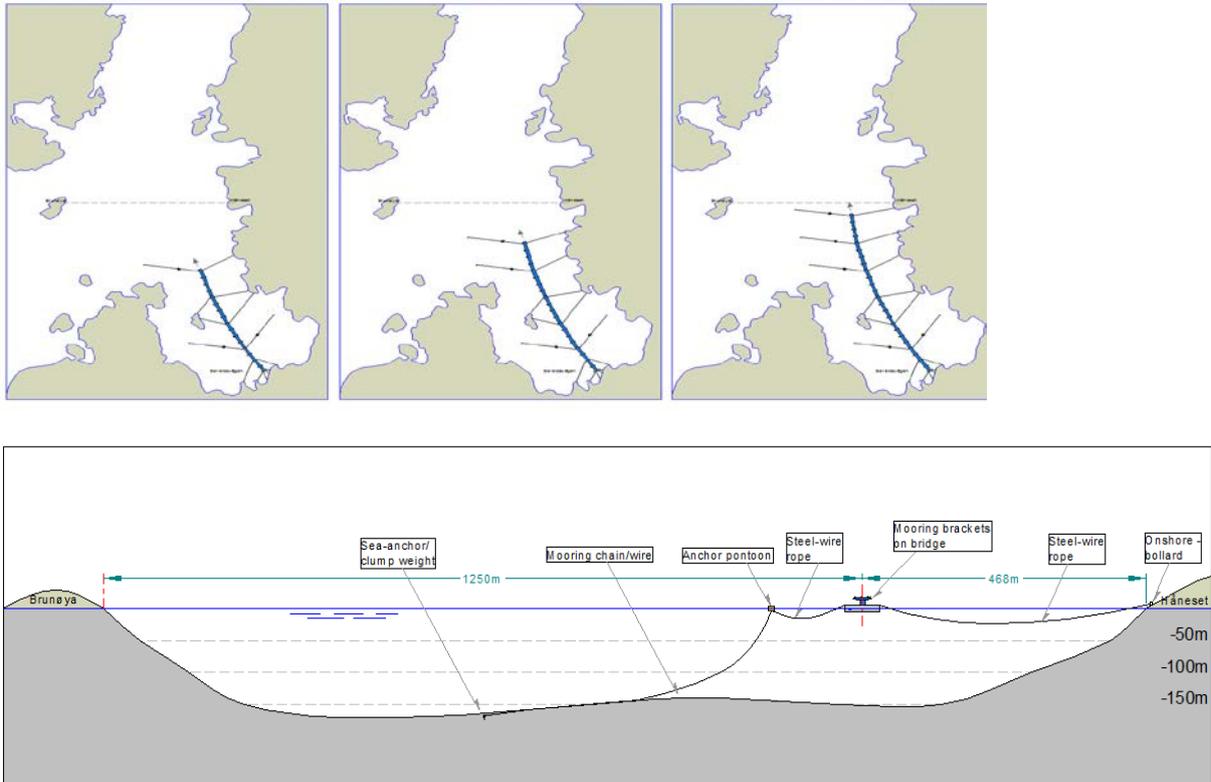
Typical temporary mooring system – typical plan view at various assembly stages and profile
